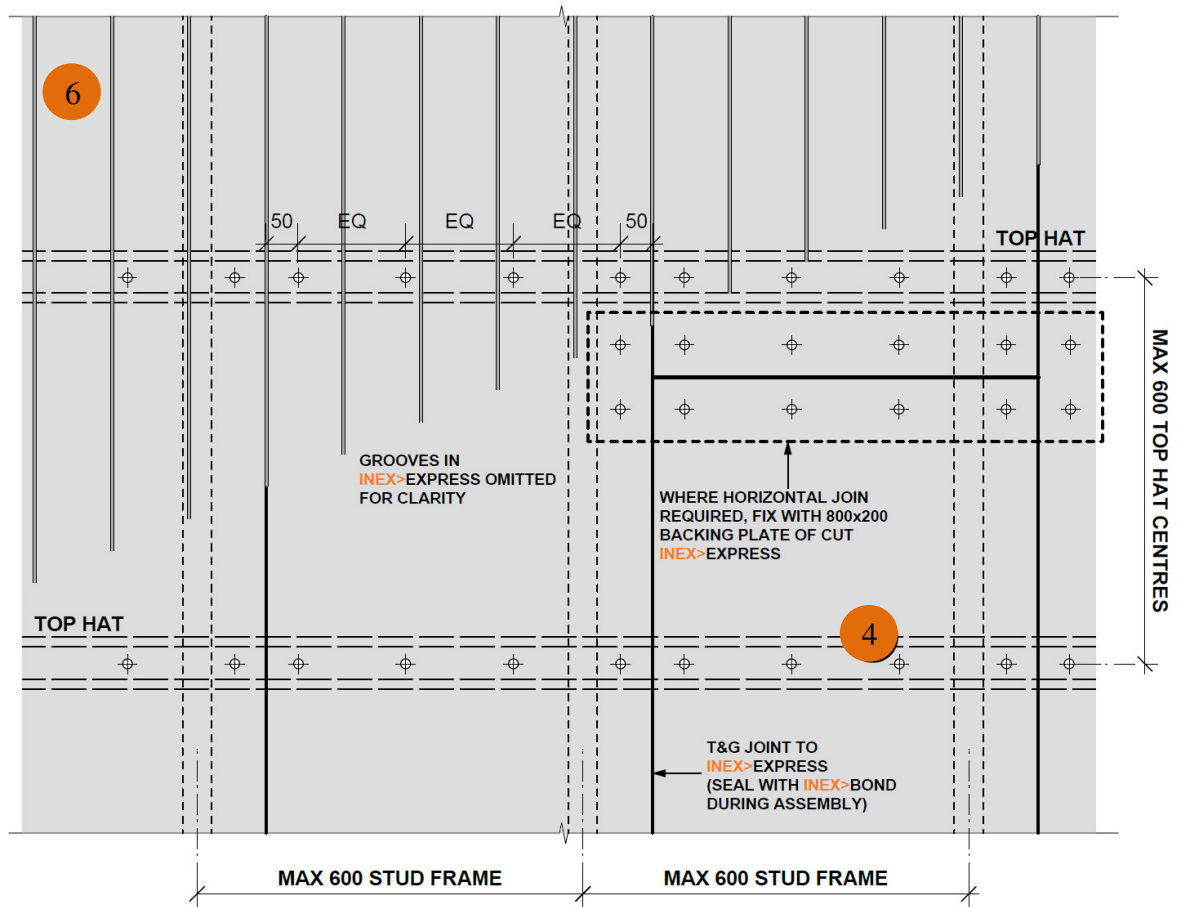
Vertical UBIQ INEX>EXPRESS Wall System Steel or Timber frame – Sheet fixing details
